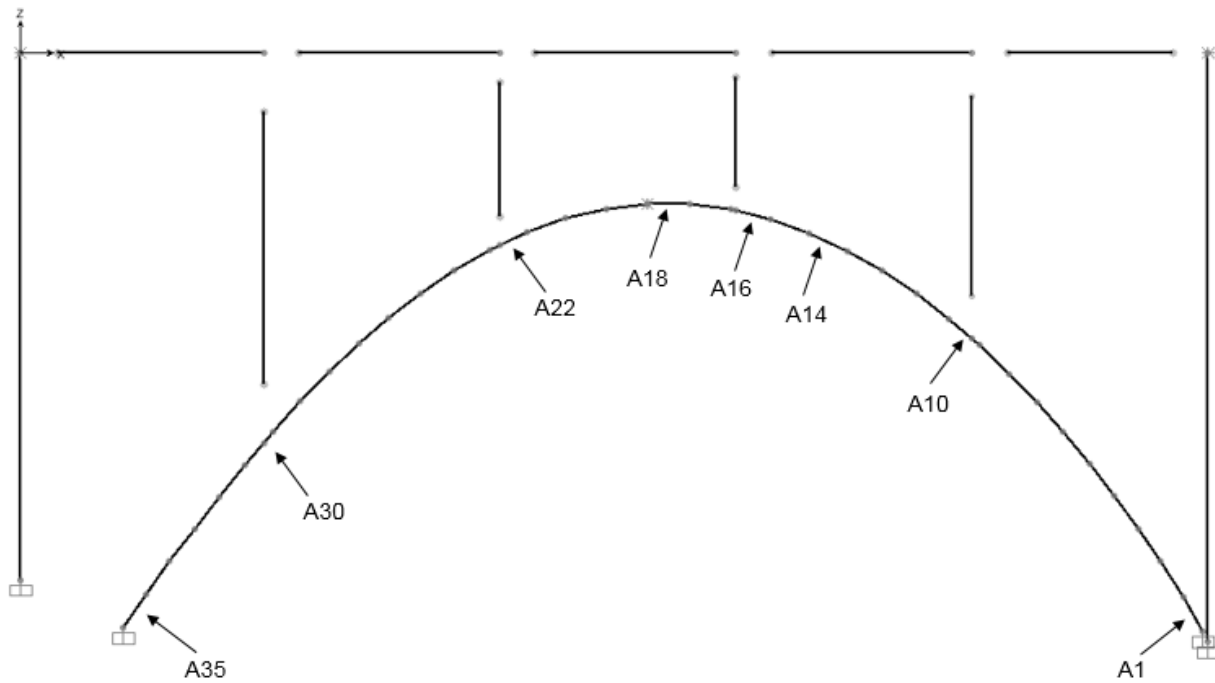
Span VII - Arch Rib with Rated Sections Labeled (SAP 2013)
